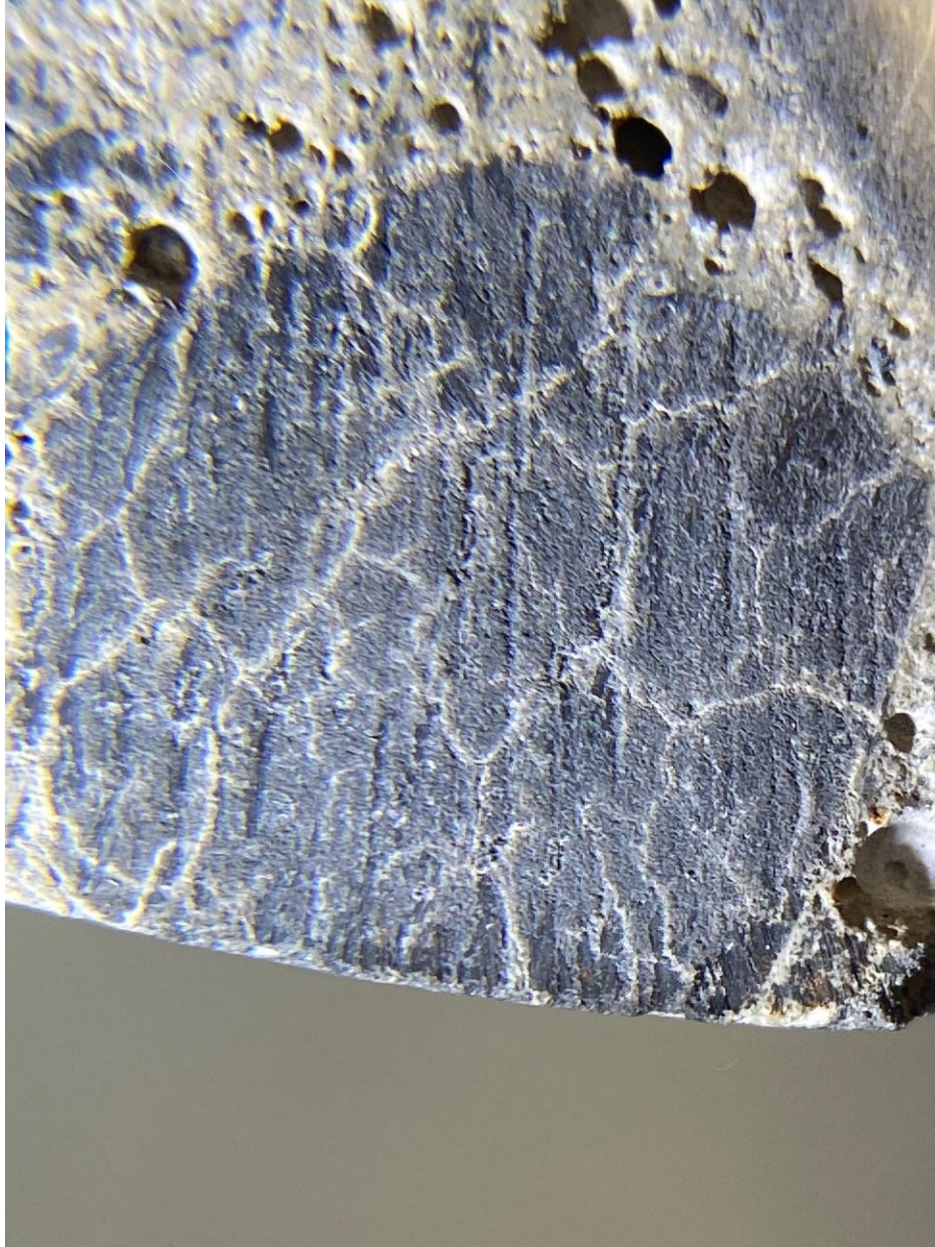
Aggregate in core 1 of lightweight concrete deck at bridge F-792 (2).
